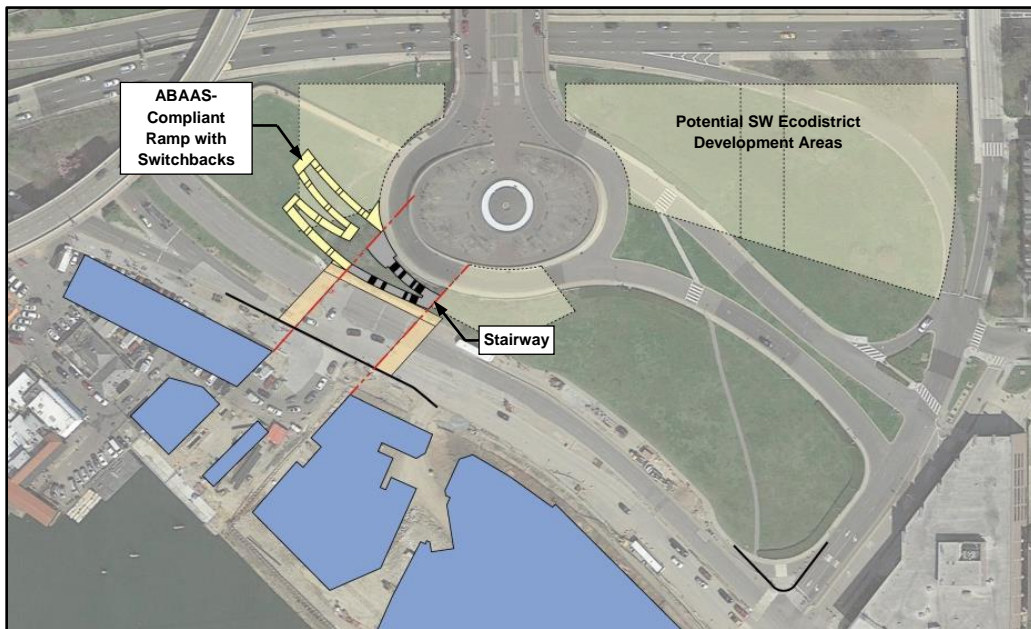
Dismissed Alternative: Stairway & Ramp with Switchbacks
